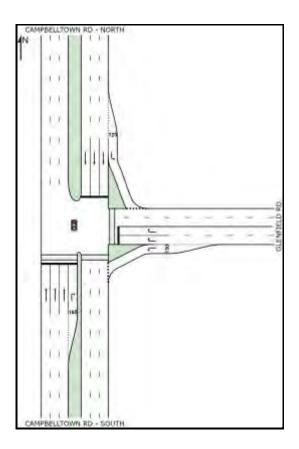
Campbelltown Road & Glenfield Road Upgrade Proposal
